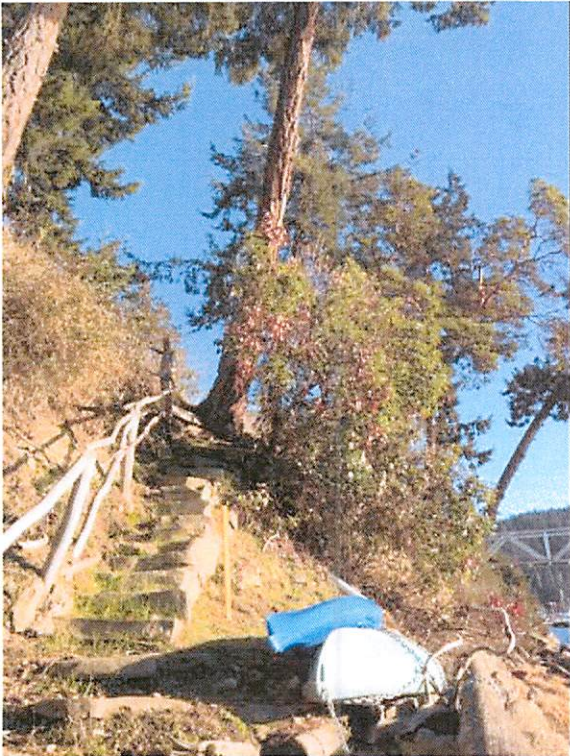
View to the North from the subject site, shows sandstone boulder substrate
